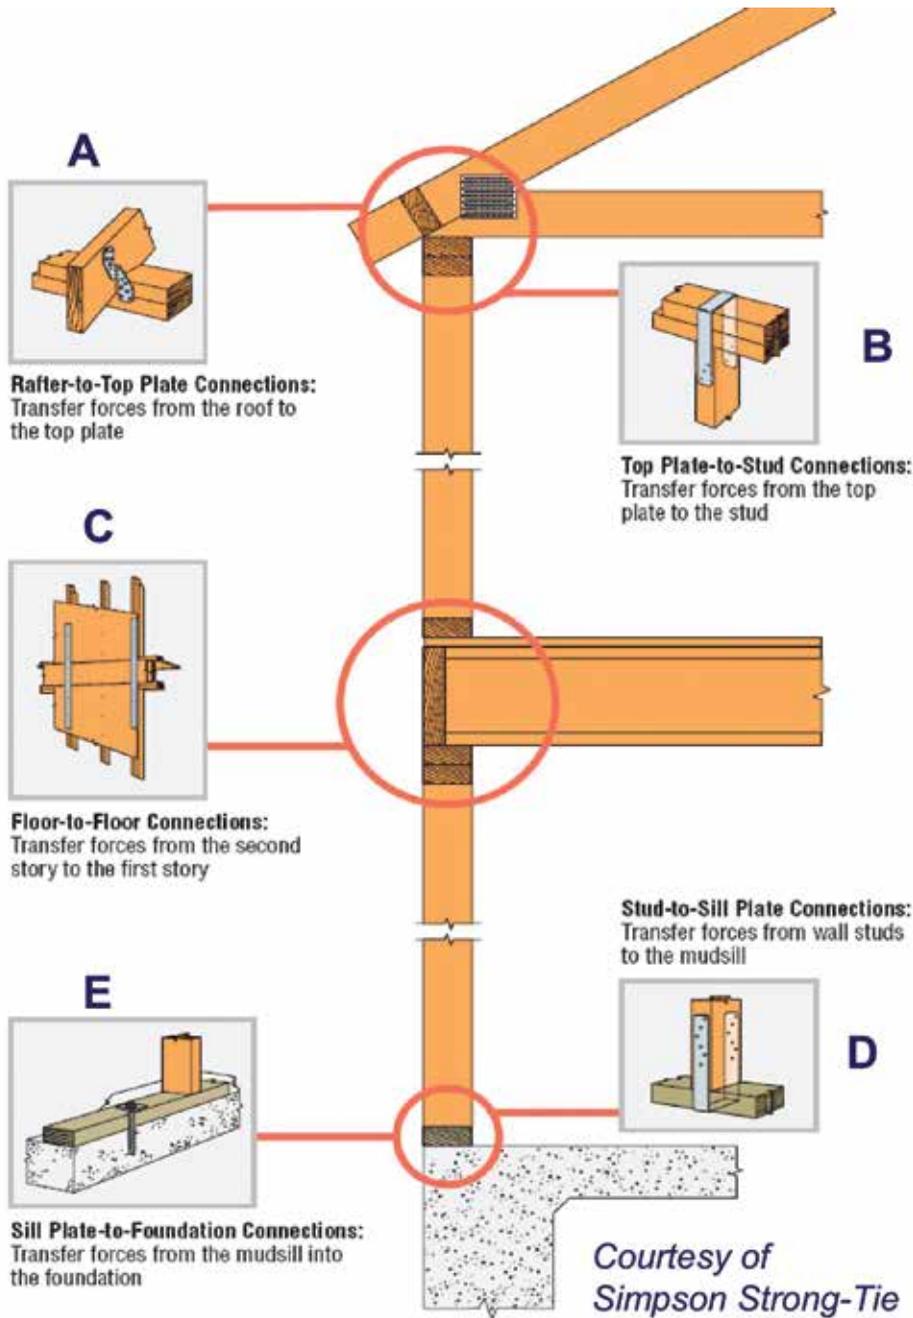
Continuous load path connection tie examples. Clips tying the roof to the wall (A, B), the wall of a higher story to the wall of a lower story with straps (C), the wall to the foundation with plate ties (D) and anchors (E). For a single story house, the connections at C are not needed. New homes may have these ties, older homes may not and could be retrofitted. Source: Simpson Strong-tie.
